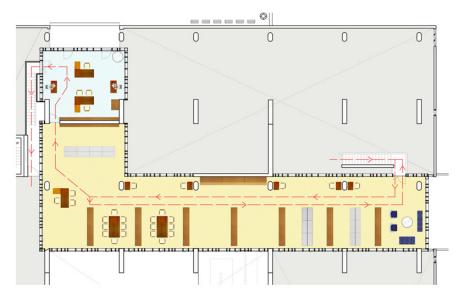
Proposed layout of Museum Library with Staff Office at the rear on the Second floor
